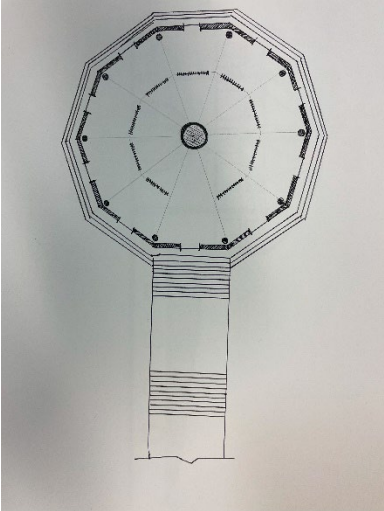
Proctor’s Ledge Memorial Building Ground Floor Plan
